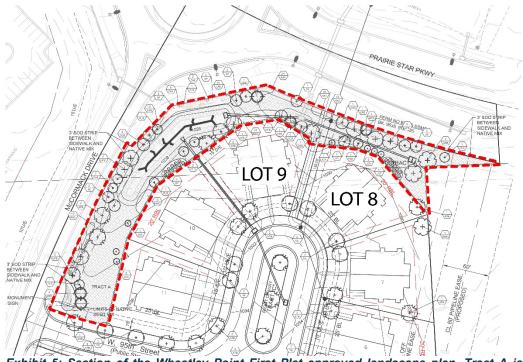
Section of the Wheatley Point First Plat approved landscape plan. Tract A is outlined in the dashed red line.
